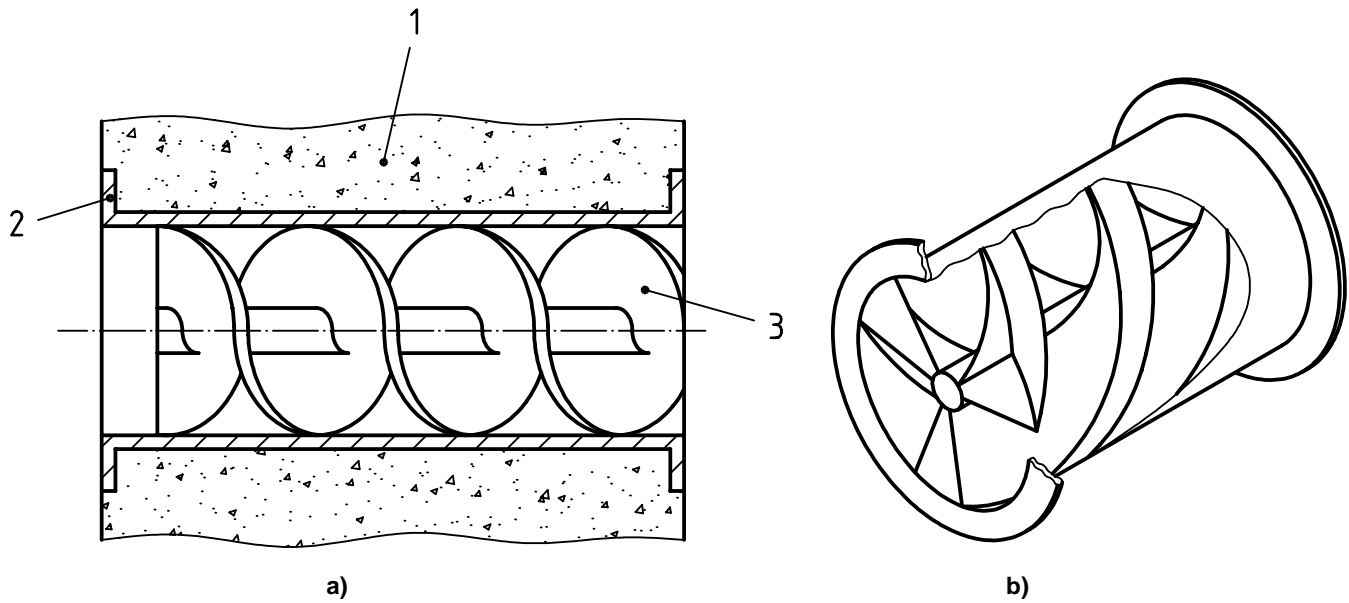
Examples of conventional ventilation penetrations with additional shielding placed outside the shielding wall
